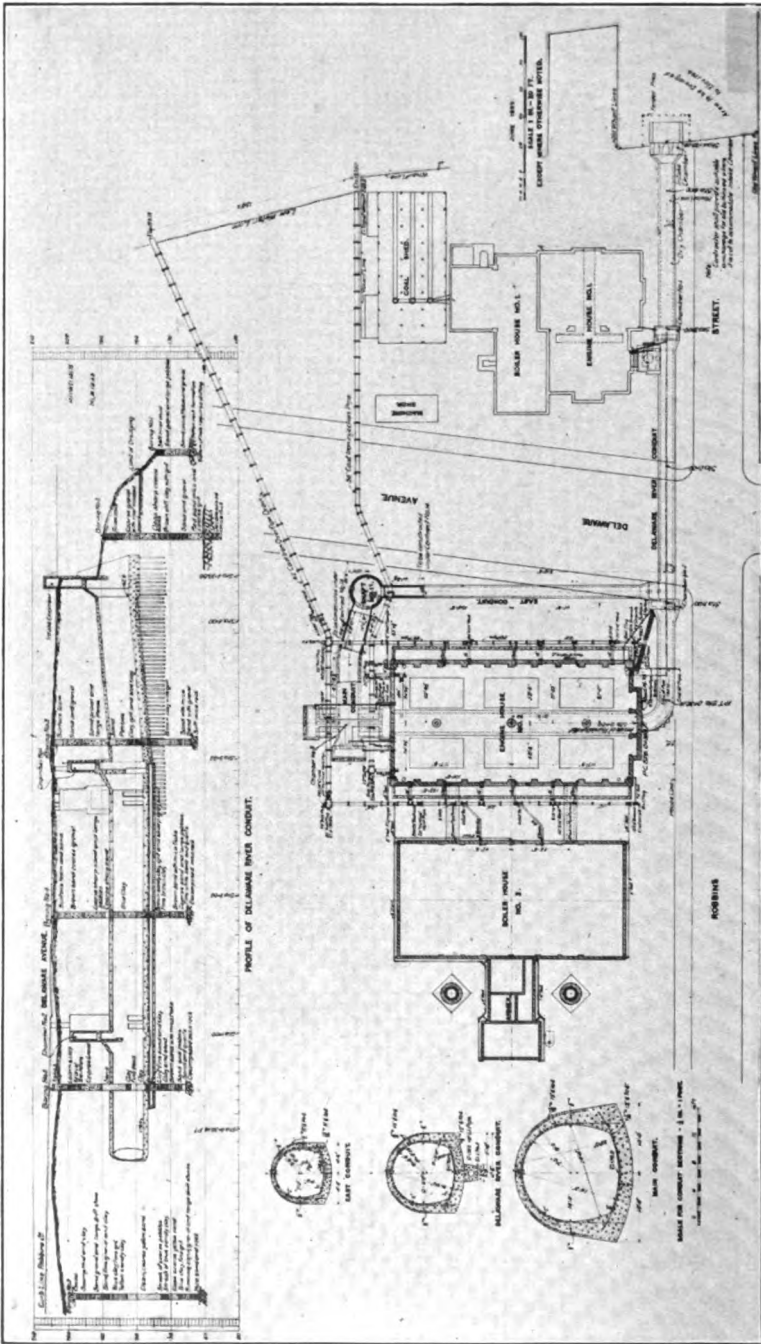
LARDNER'S POINT PUMPING STATION—CONDUITS AND PIPING.
